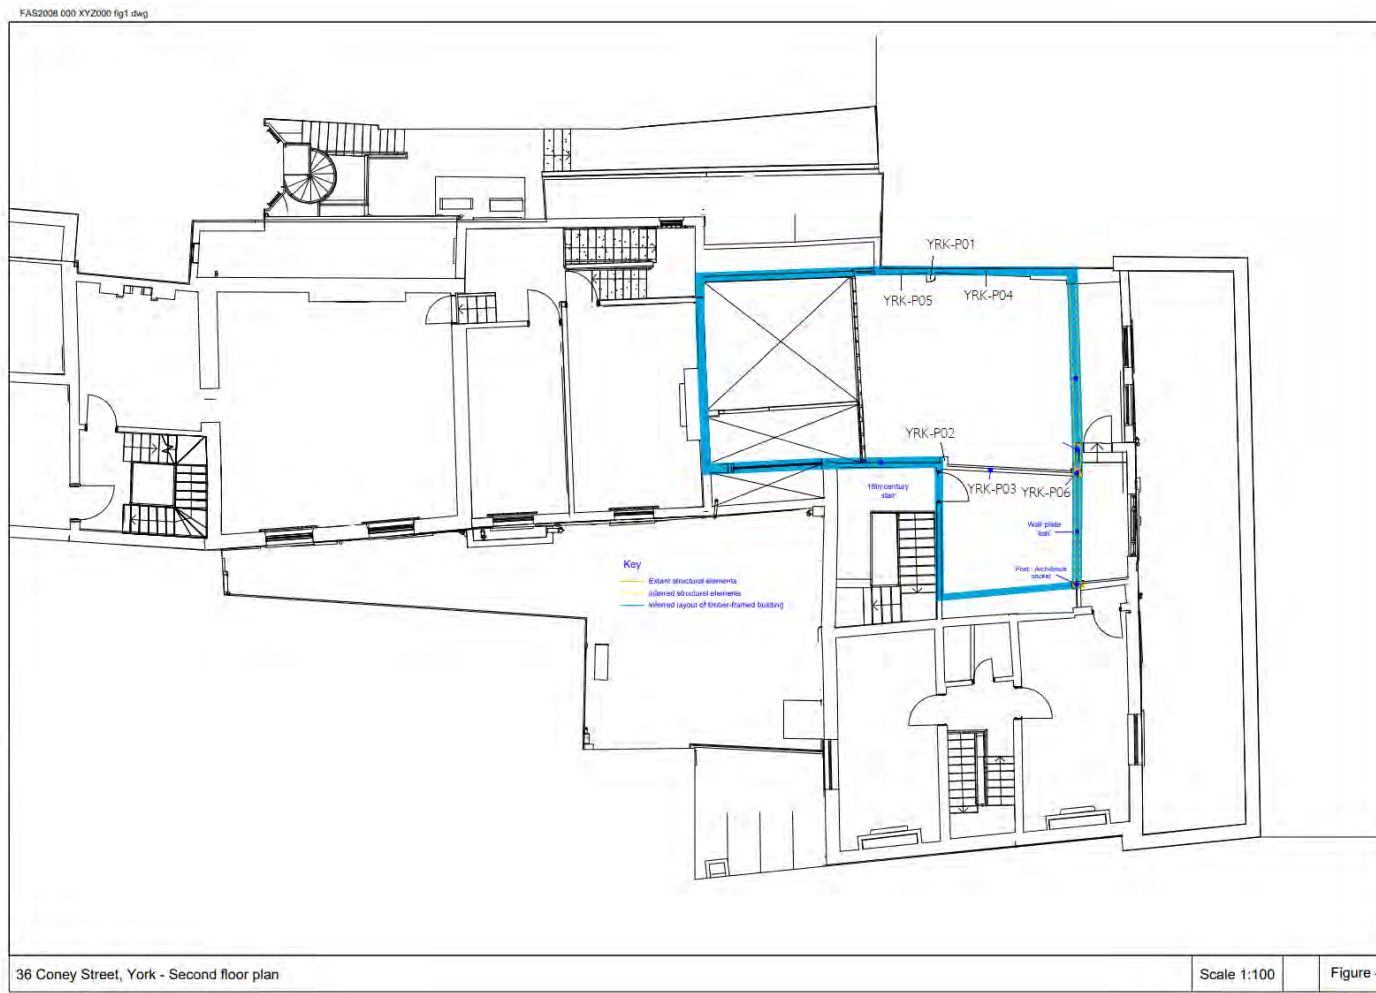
Second-floor plan, showing the location of samples YRK-P01–06 (FAS)
